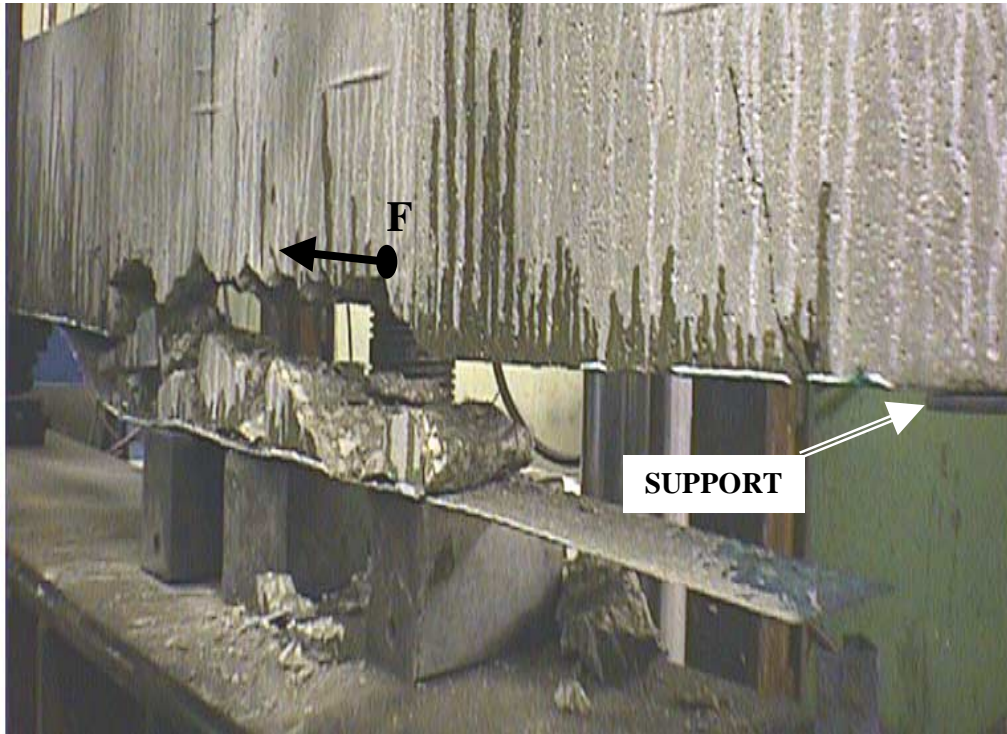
Concrete Cover Delamination – Failure Mode II (Beam A2)
